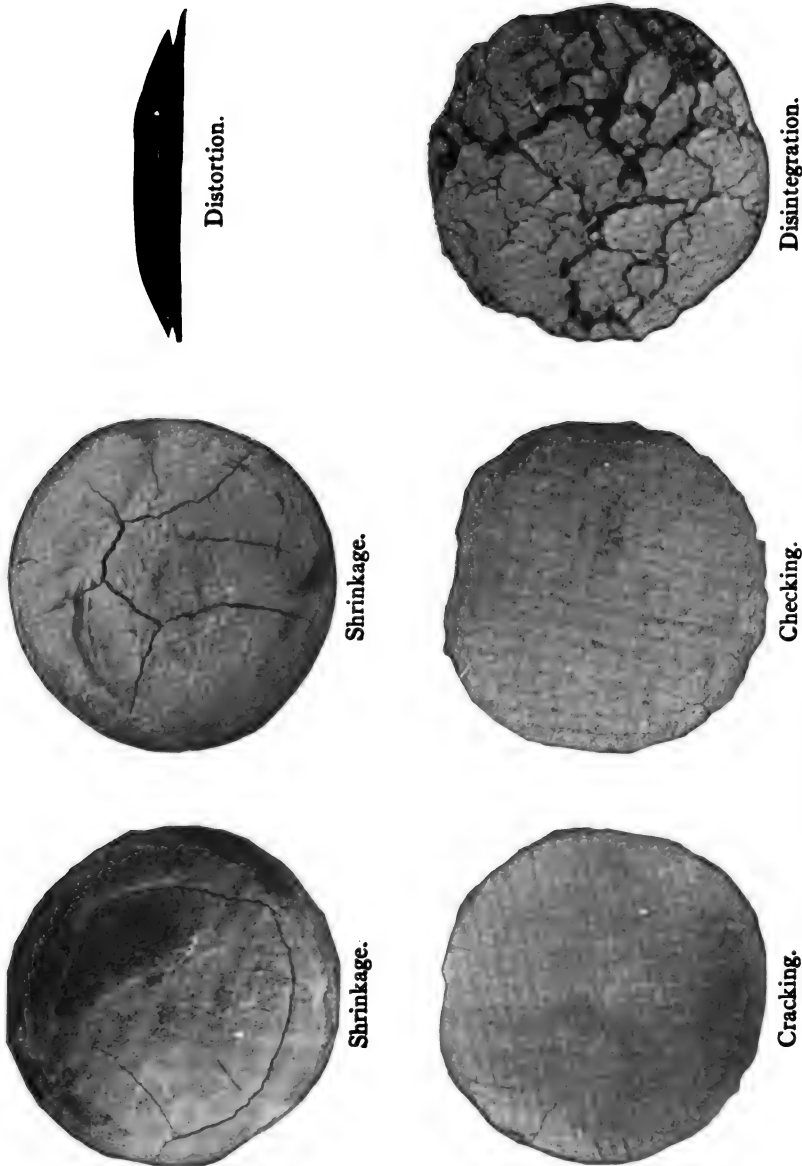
TYPICAL FAILURES IN SOUNDNESS TEST.
